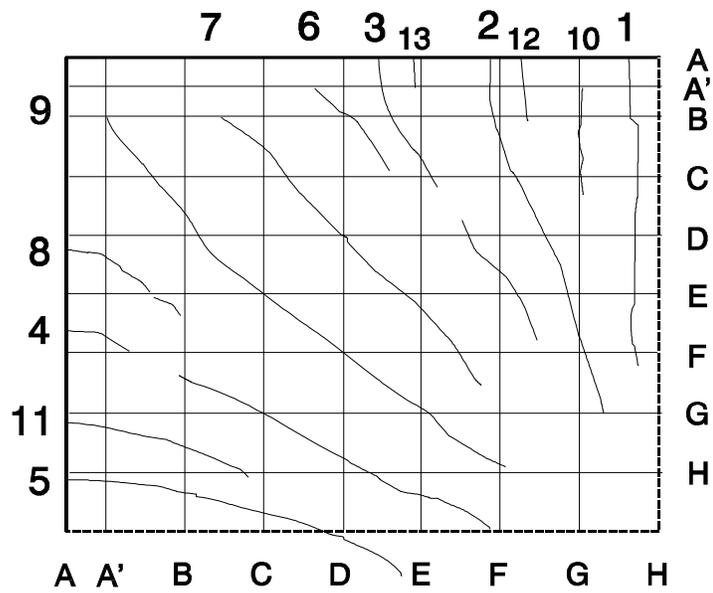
POJ-RC-100-TH cracking pattern on north face of joint at service load
